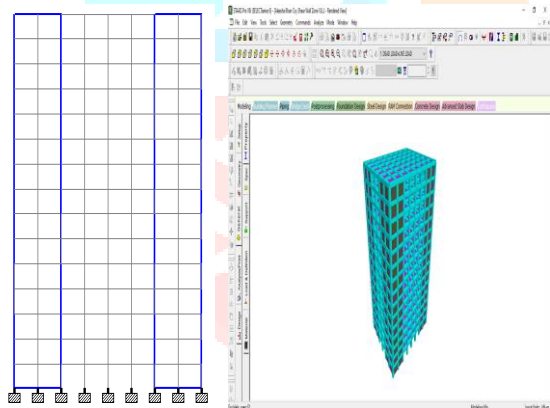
Framed building with Shear wall at the exterior side around the corners, Zone- III & IV
